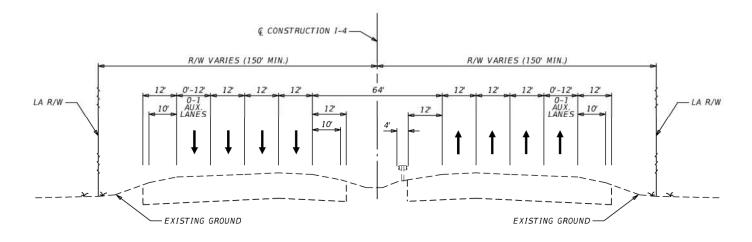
Existing Typical Section (W. of SR 529, Sta. 730+00.00 to W. of World Dr., Sta. 820+00.00)
